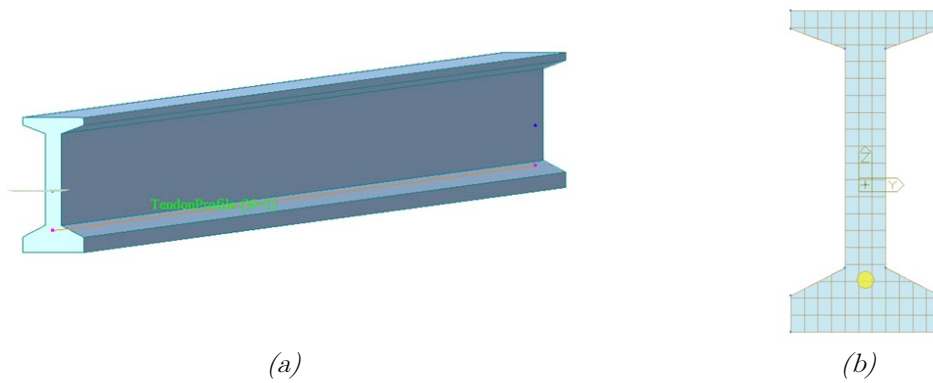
MIDAS GEN*: Prestressed concrete beam element (a) and fiber section (b).
